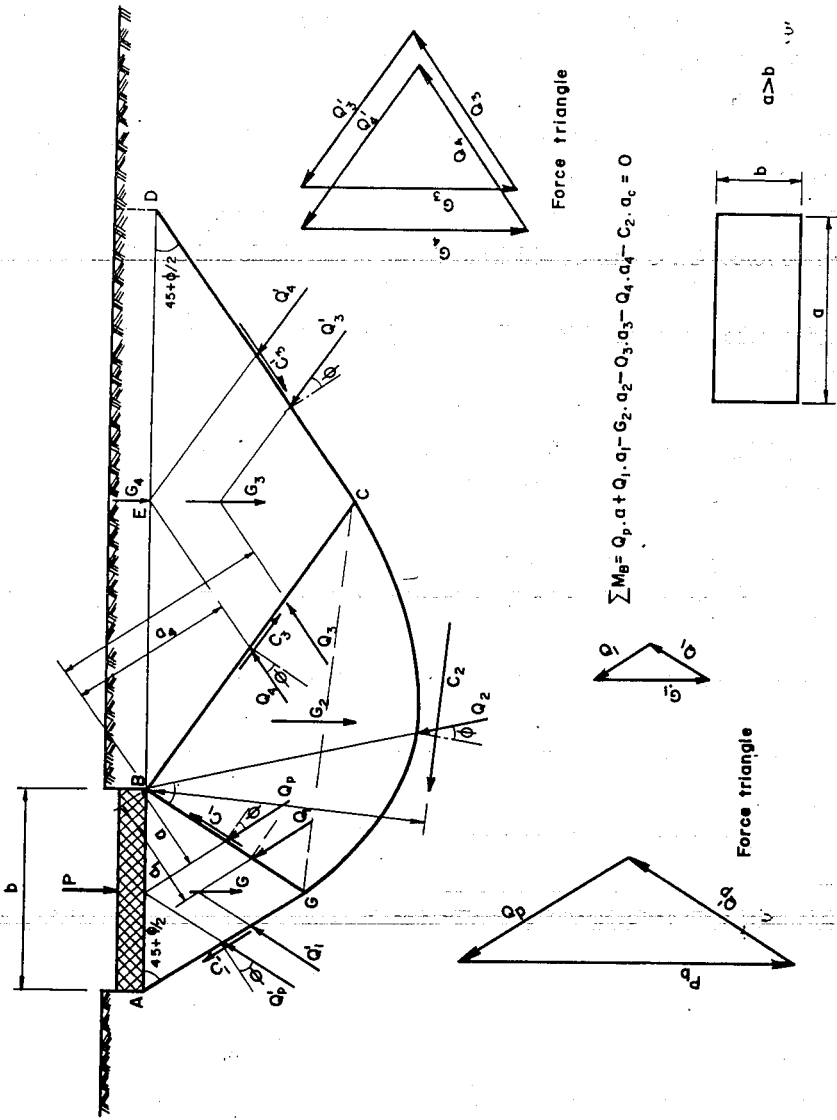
Bearing failure under centrally loaded foundation for long term loading condition ($c \neq 0, \phi \neq 0$)
